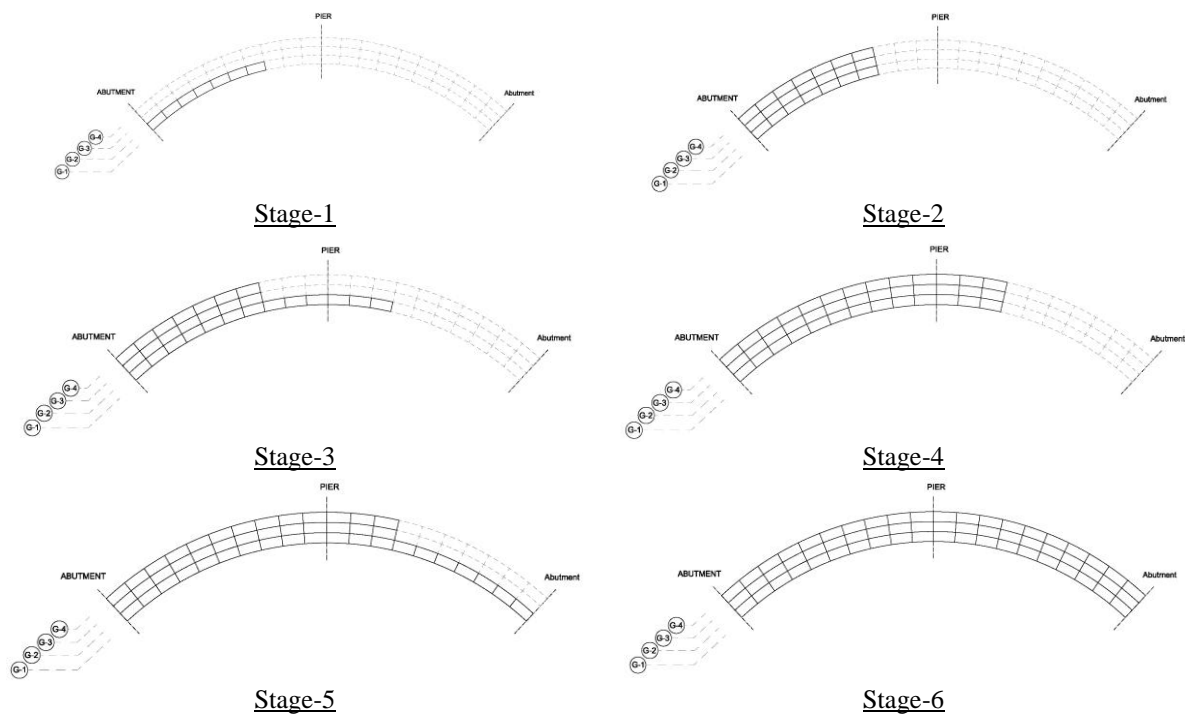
Stage 1 to Stage 6 for Paired-Girder (inner girders placed first) Erection of Two-Equal-Span, 4-Girder bridges.
